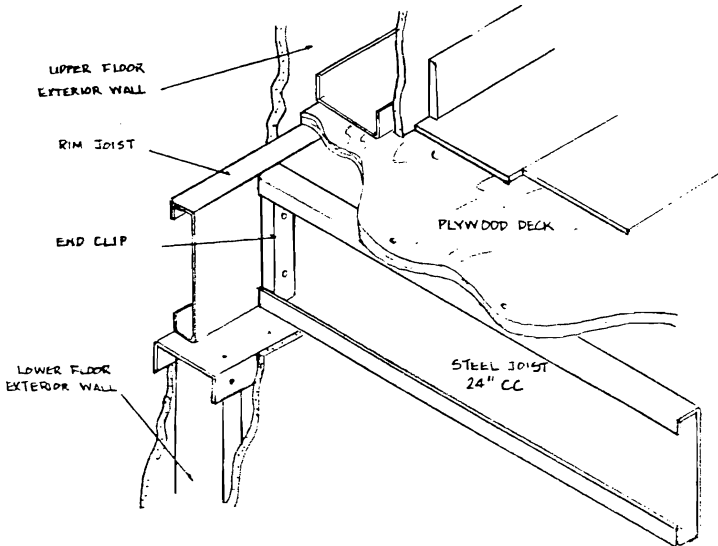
Cold-Formed Sheet Steel C-Shaped Joist/Plywood Flooring System
